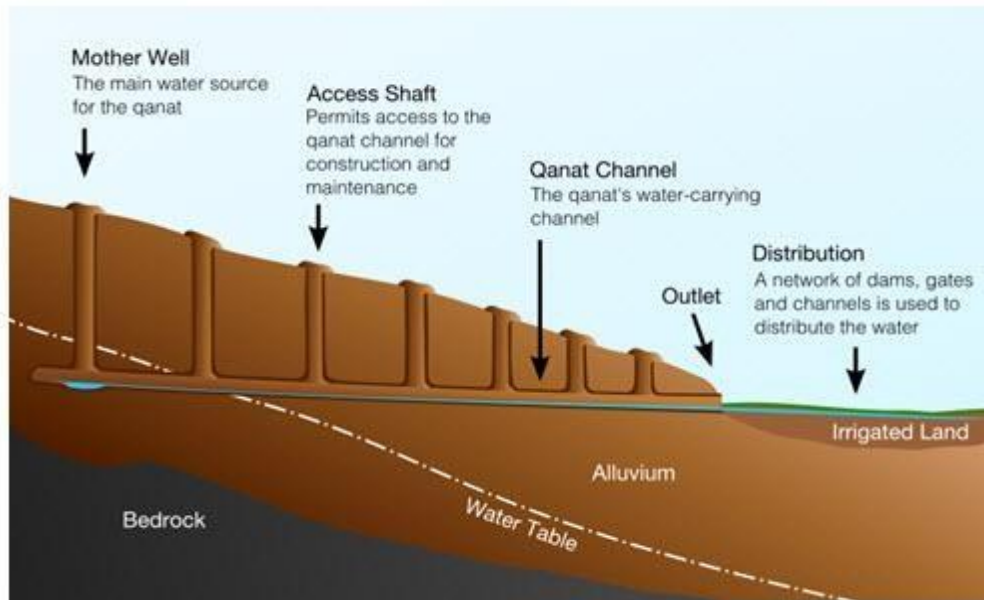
Cross Section Showing Qanats. (Source: Barron and Salas, 2009)
